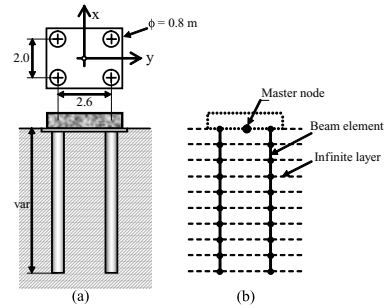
(a) Foundation of the wall; (b) Finite element model.
